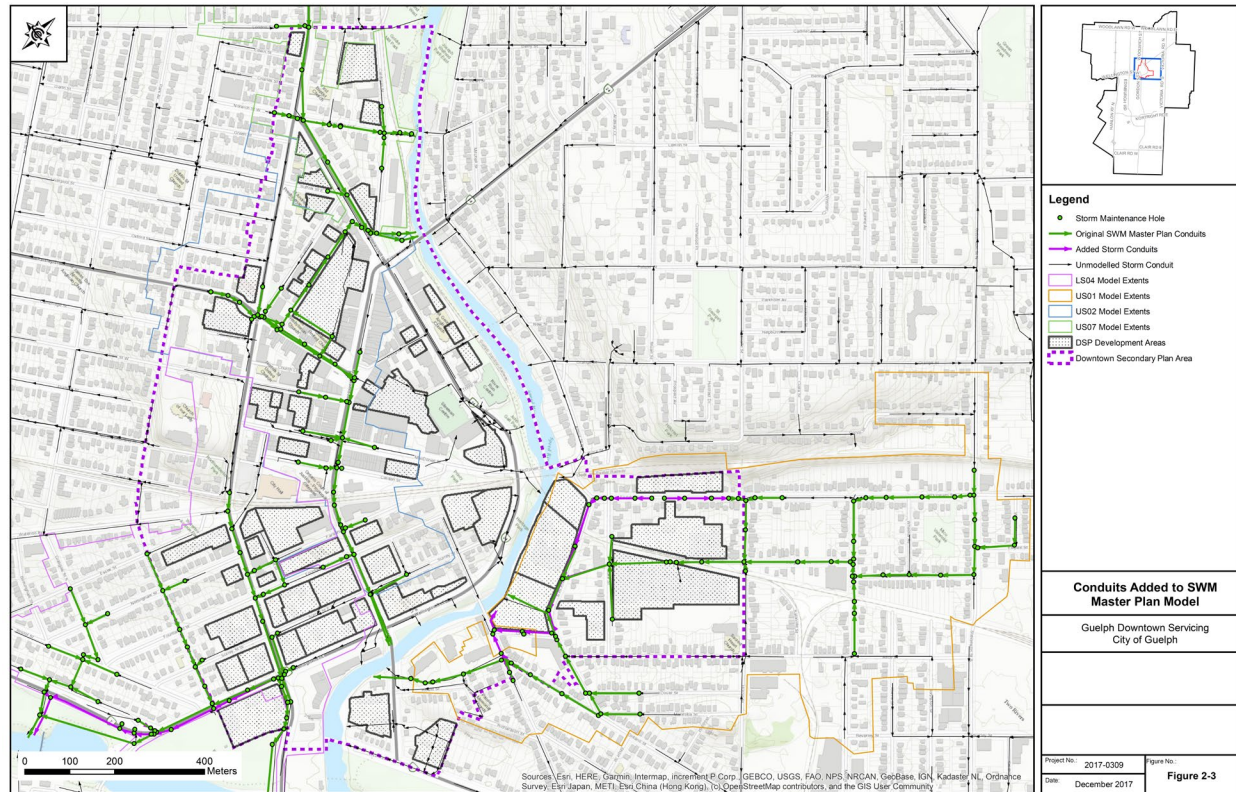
Conduits Added to Stormwater Master Plan Model
